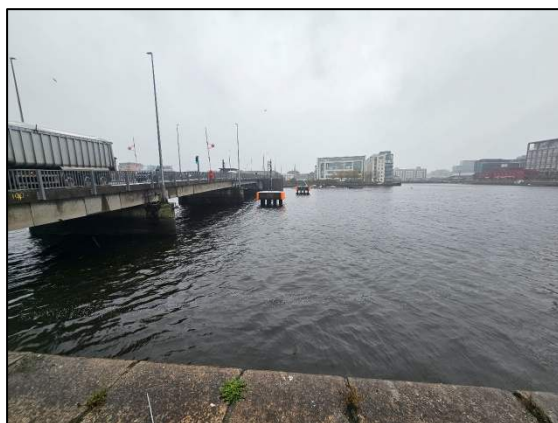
View from northwest looking south towards Tom Clarke Bridge and the MAC area of Point Bridge [JM: 30 October 2025].
